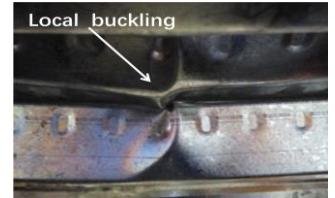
(a)), the specimens exhibited significant slip at the anchoring end (Fig. 4(b)), and there were shear cracks running through the length of the specimens. Moreover, the upper and bottom flanges and troughs of the profiled steel sheet at the mid-span underwent significant buckling (Fig. 4c), leading finally to brittle longitudinal shear failures.
